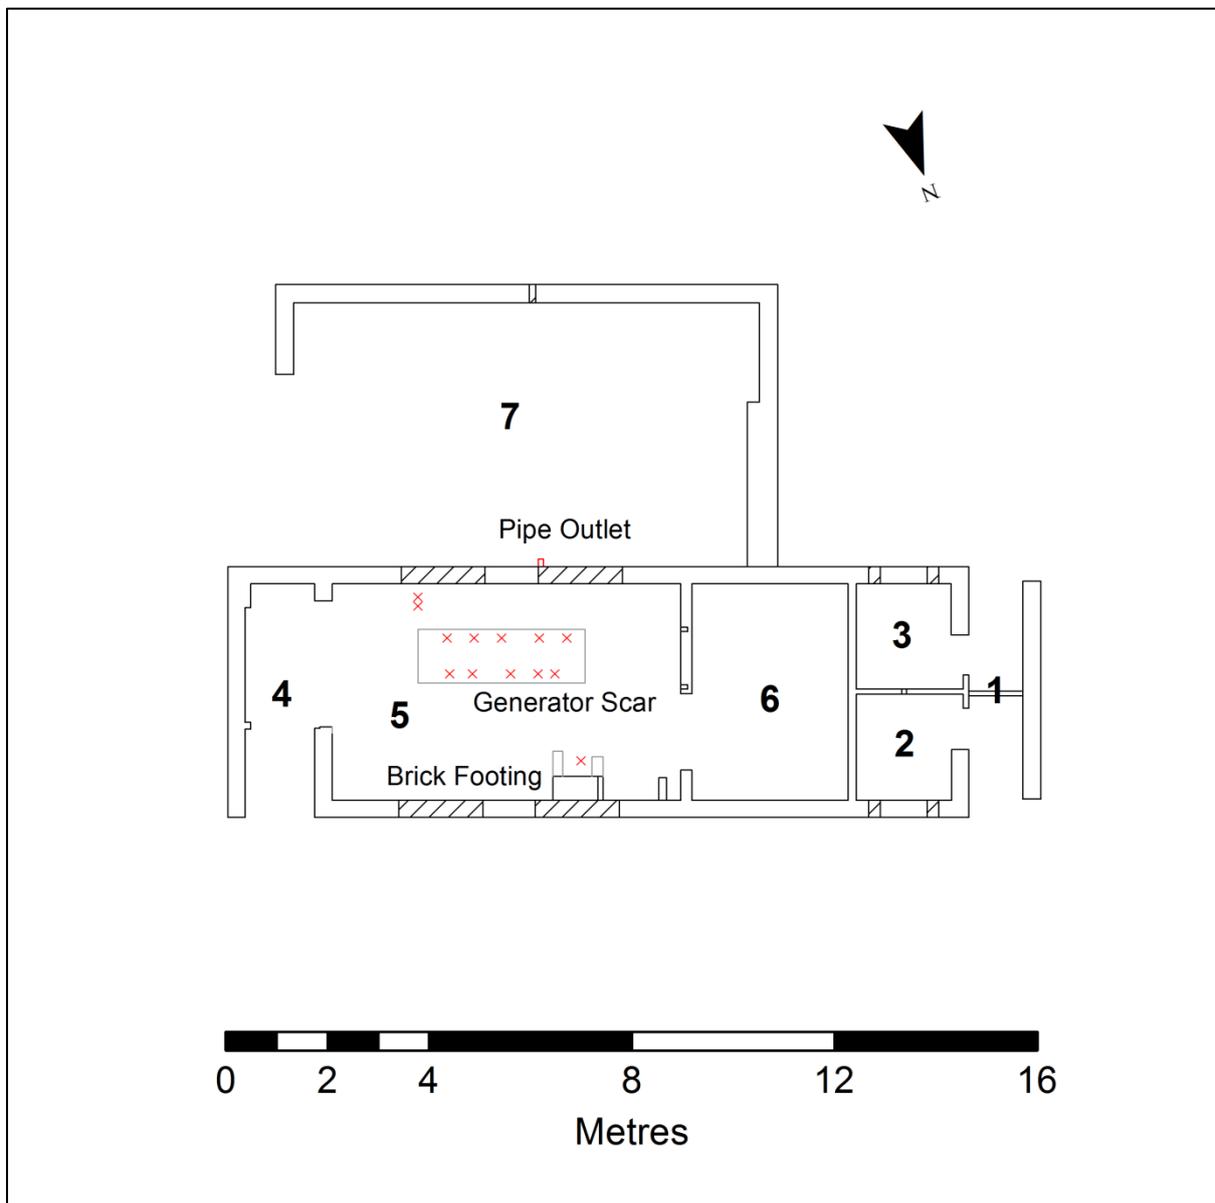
Floor plan of the Generator Building (Gregory 2013).
